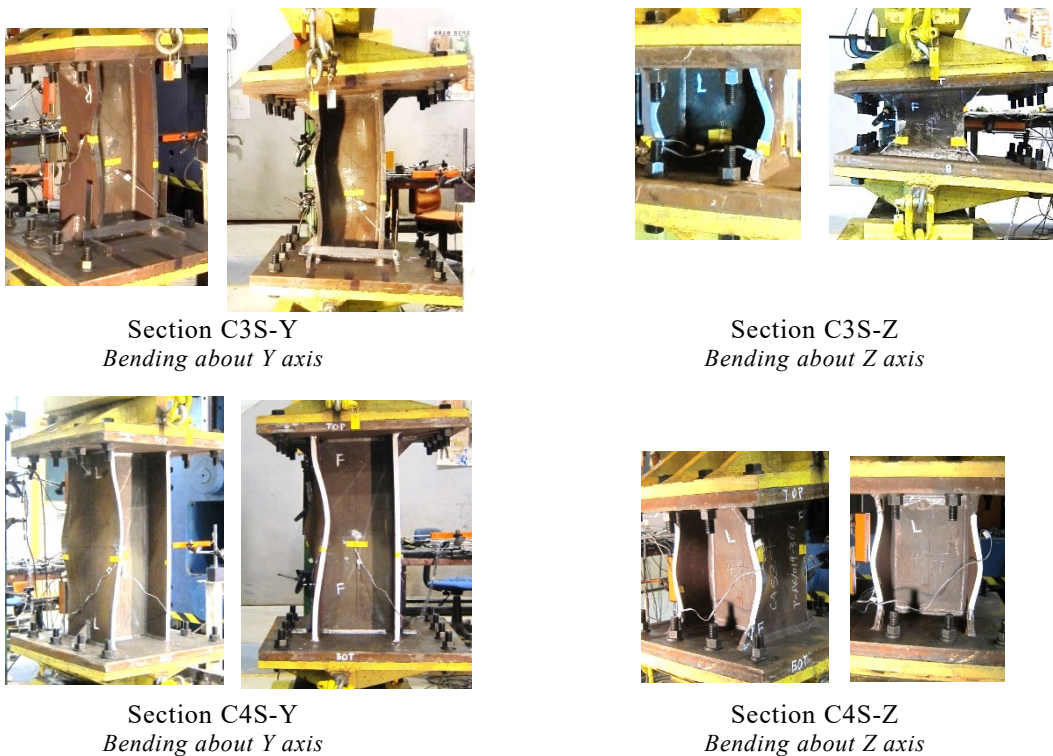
Typical failure modes of S690 stocky columns under combined compression and bending
